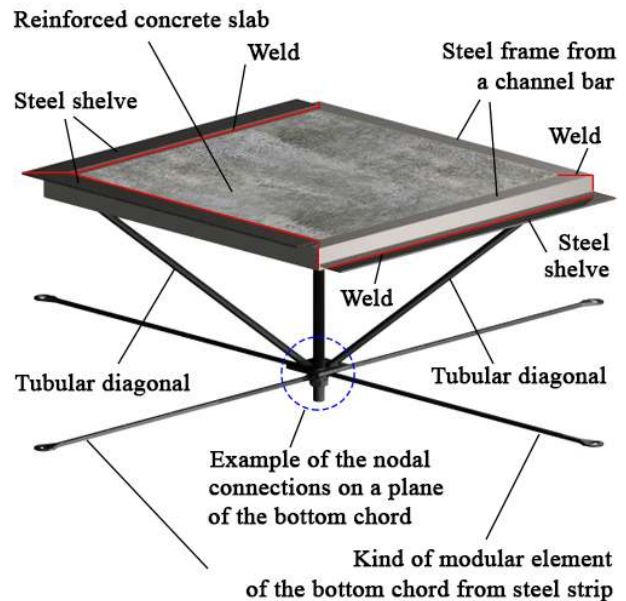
Improved designs of the steel and concrete composite space module with steel shelves
